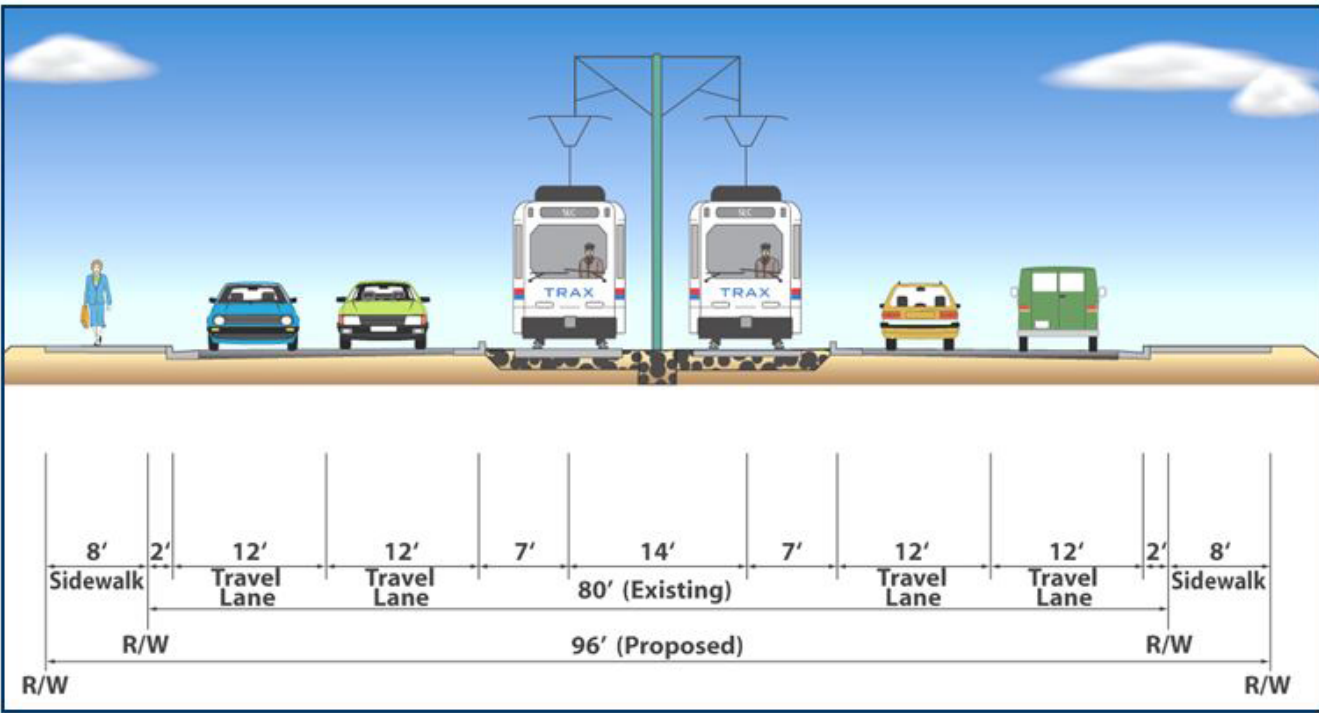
4 TYPICAL MINOR ARTERIAL WITH IN-STREET LIGHT RAIL CROSS SECTION
